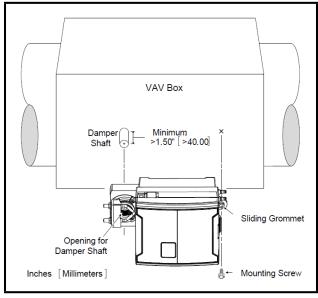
VAV Damper Shaft Standard Mounting Diagram
